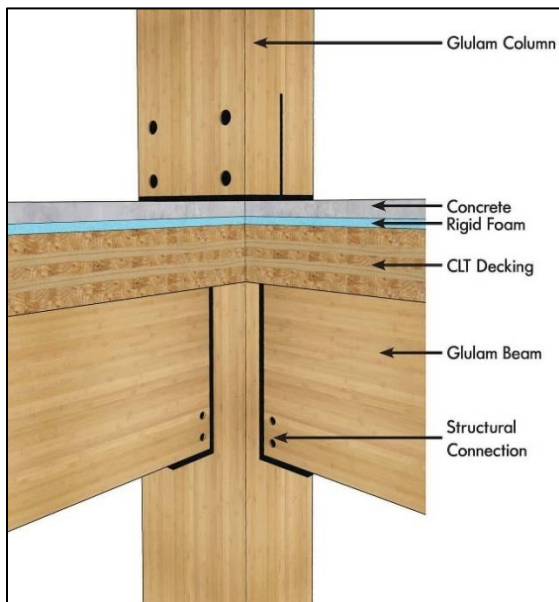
Typical CLT Floor Panel to Glulam connection (Source: LEVER Architecture, 2020)
